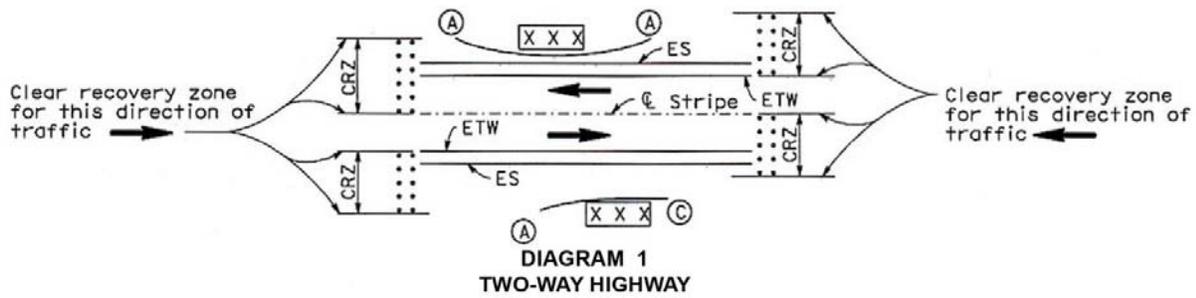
Railing at Fixed Objects or Embankment Installations
